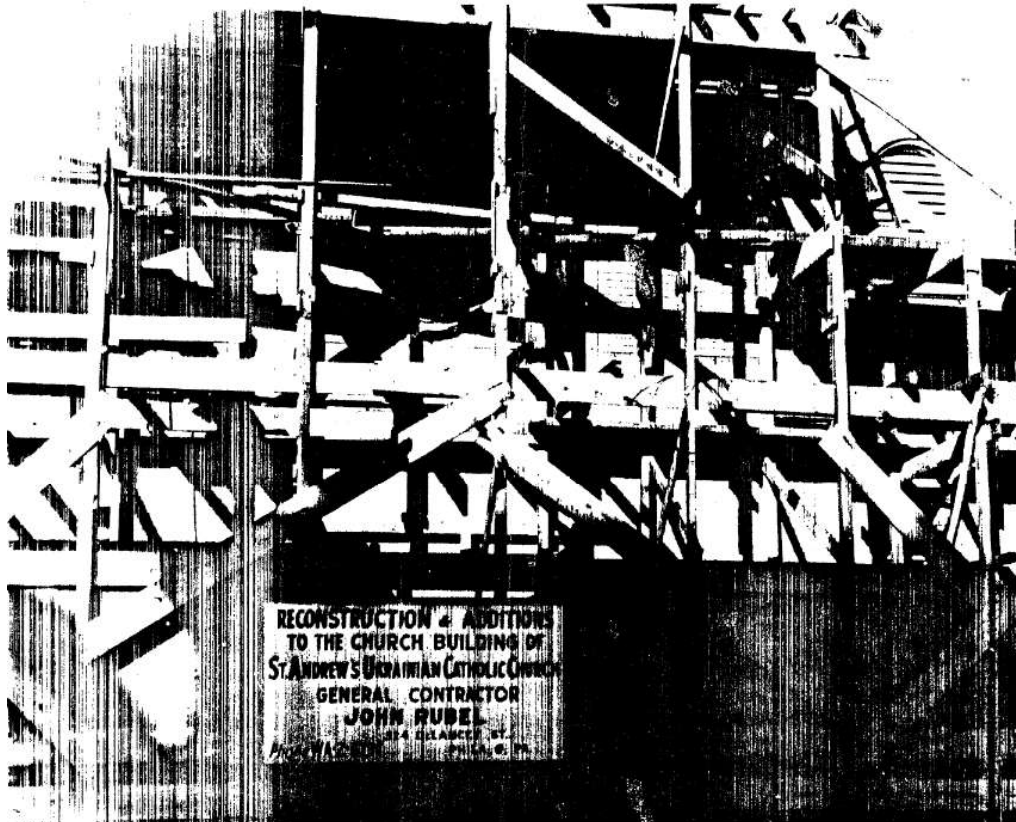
Undated photograph (c. 1946) of “reconstruction and additions to the church building of St. Andrew’s Ukrainian Catholic Church.” Source: PHC property file.
